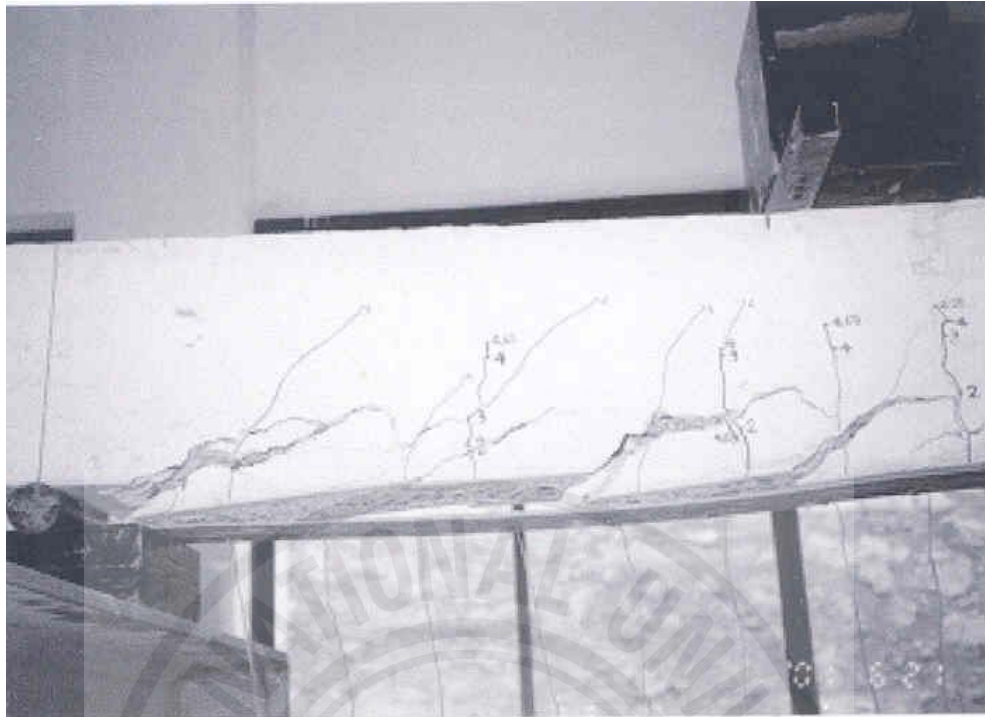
Concrete cover failure of beam FPL1
